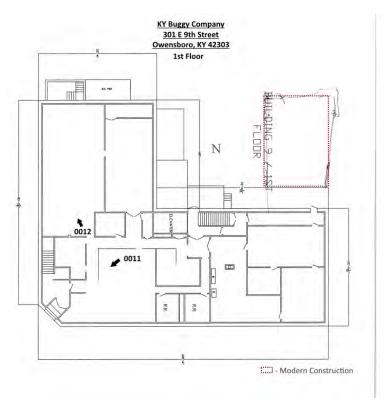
KY Buggy Co, First floor plan, keyed to photo log below.
